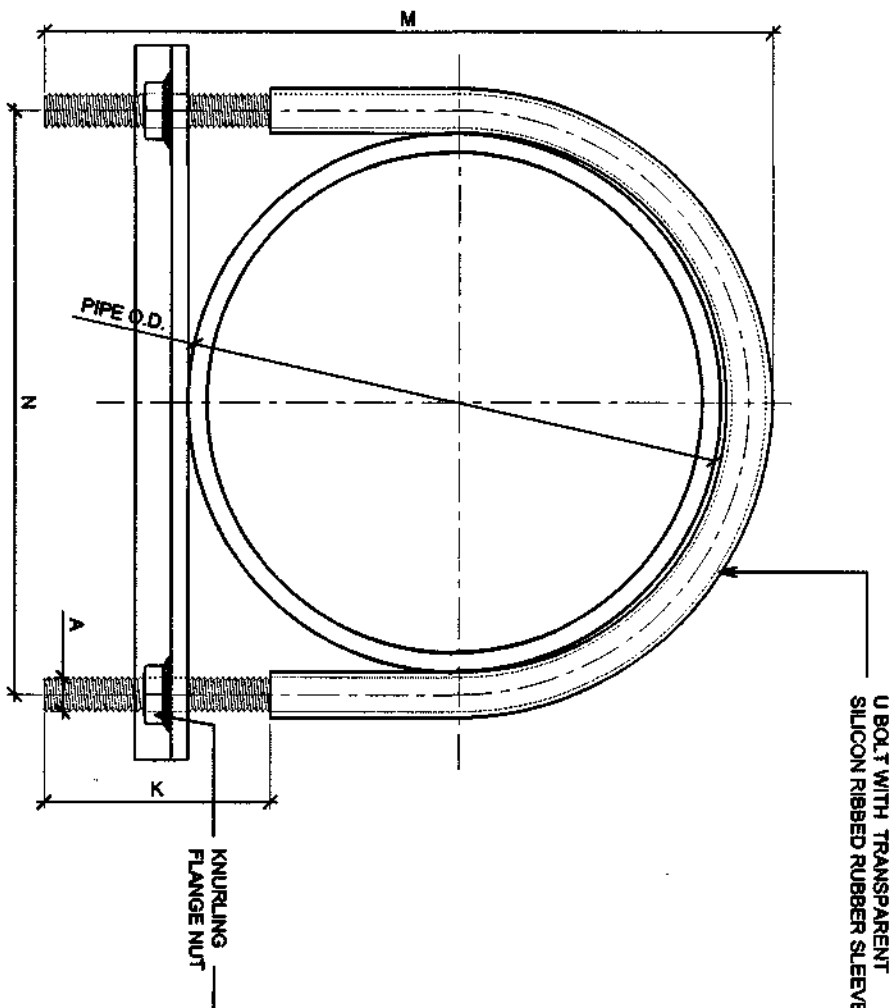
DETAILS OF BRACKET & OTHER MISC DETAILS FOR VERTICAL PIPE SUPPORTING SYSTEM
